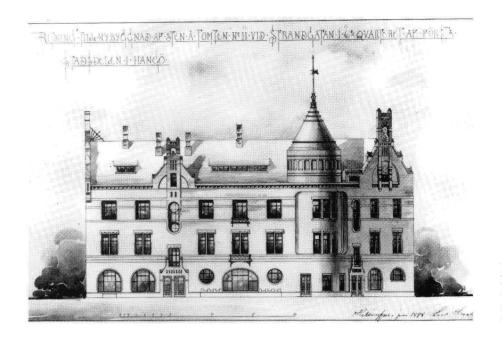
Design for a spa hotel in Hanko with health bath facilities on the first floor, 1898, completed in 1900. (Hanko City Archives, photo Hanko Museum).
